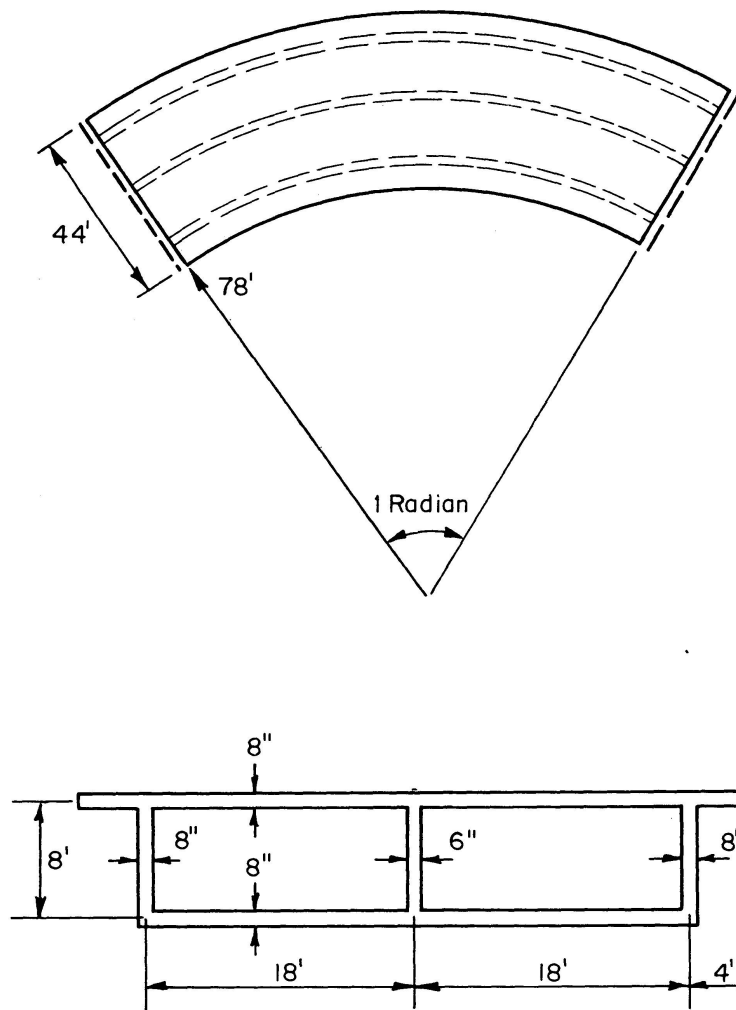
Plan and Section of the Curved Box Girder Bridge in Example 2 ($E = 1$, $\nu = 0.16$).
